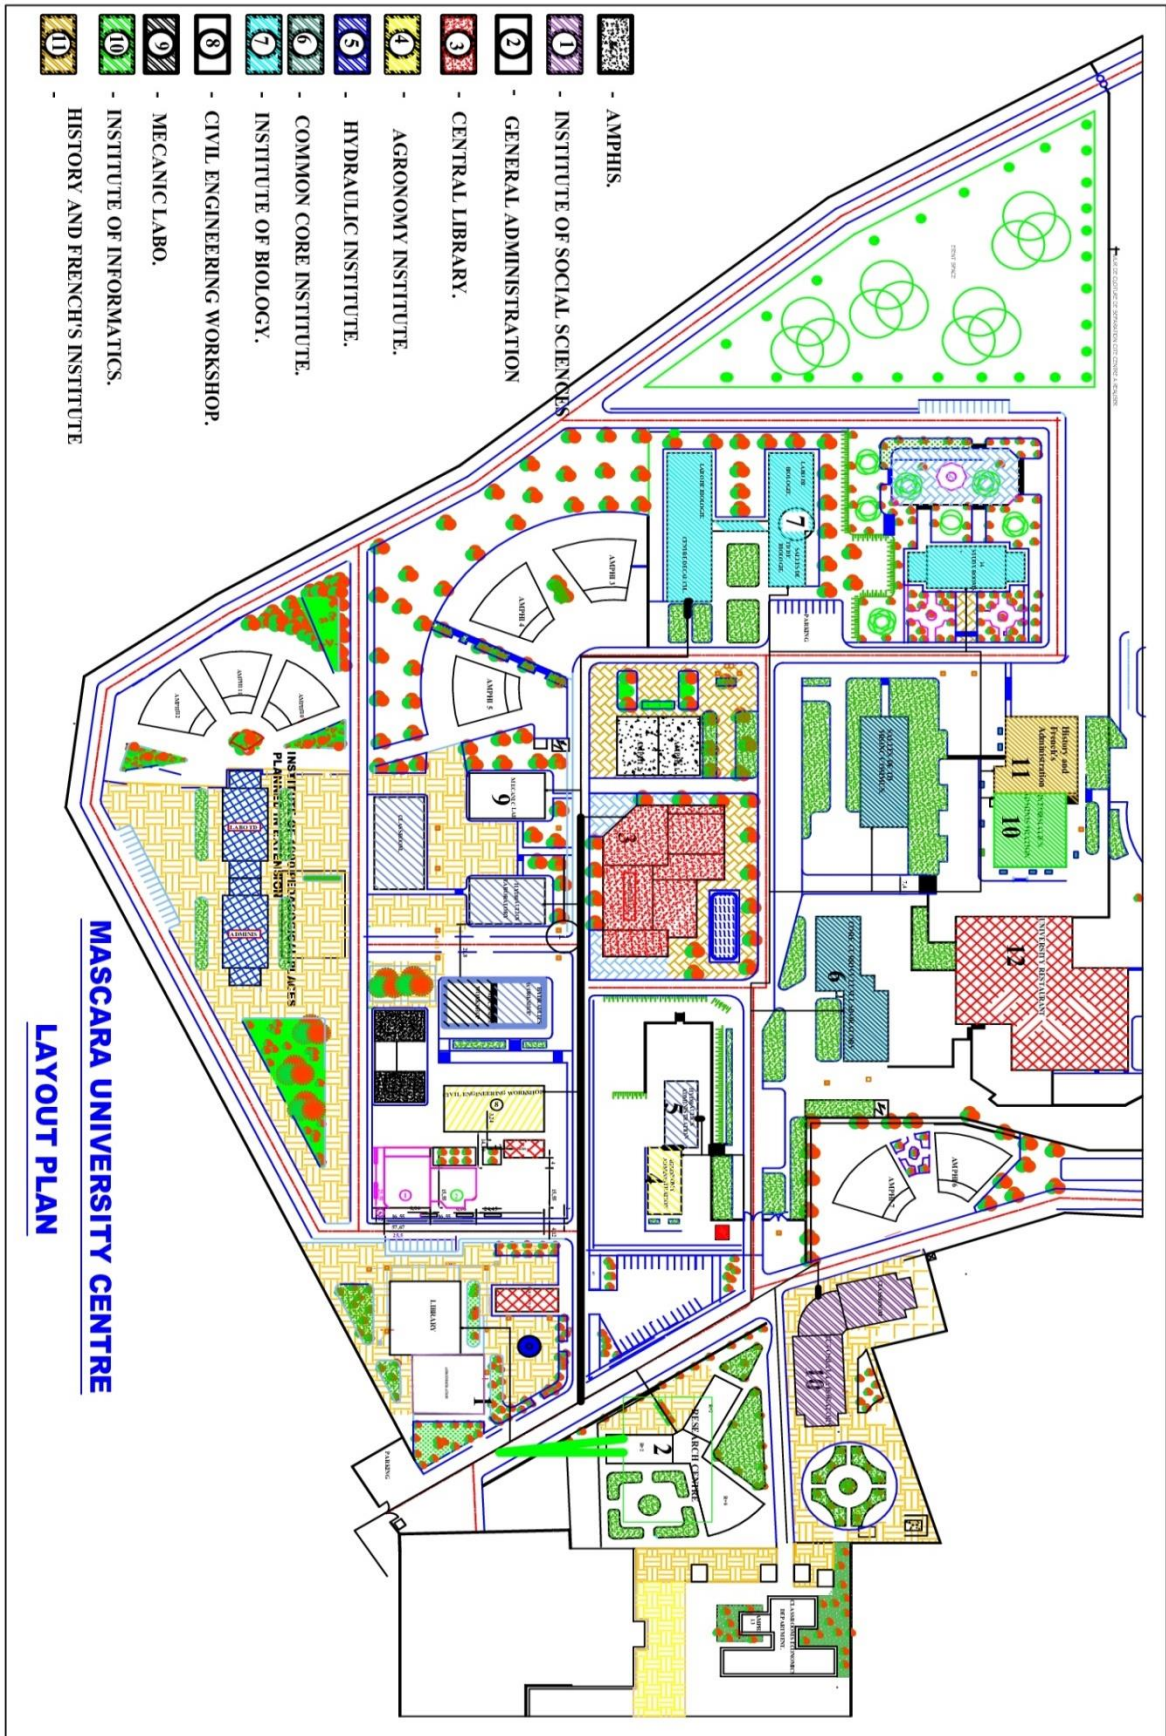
1: Mascara University layout plan (Adapted from Public Equipment Directorate )
